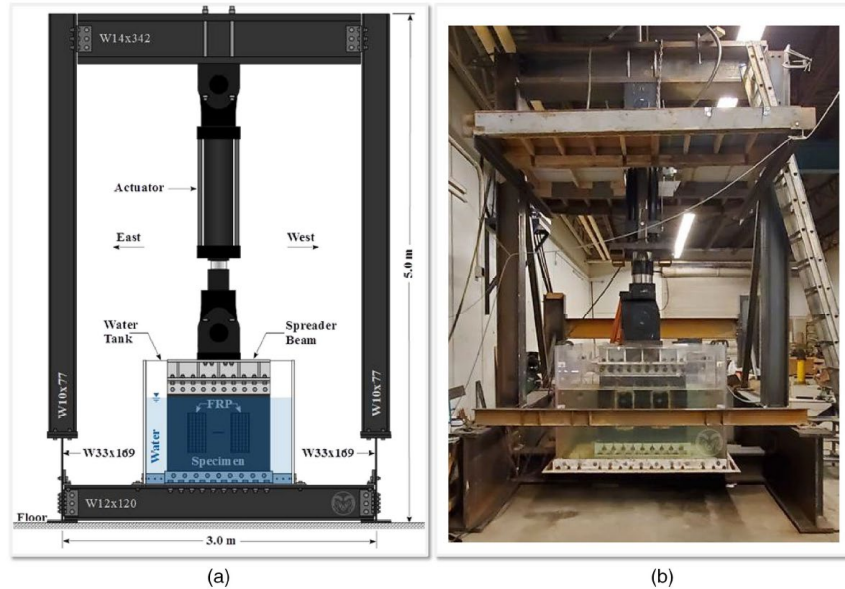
(a) Schematic of self-reacting test frame looking south; and (b) photo of the test frame.
